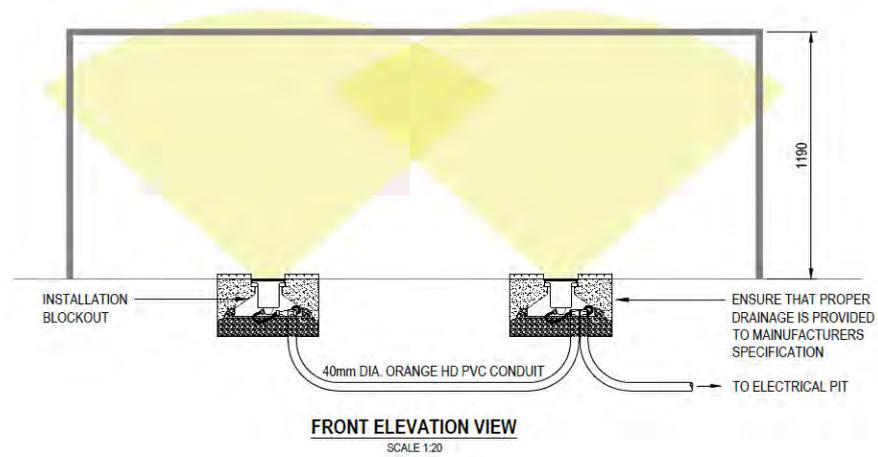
Front Elevation View of Entry Wall. Source: Webb Australia
